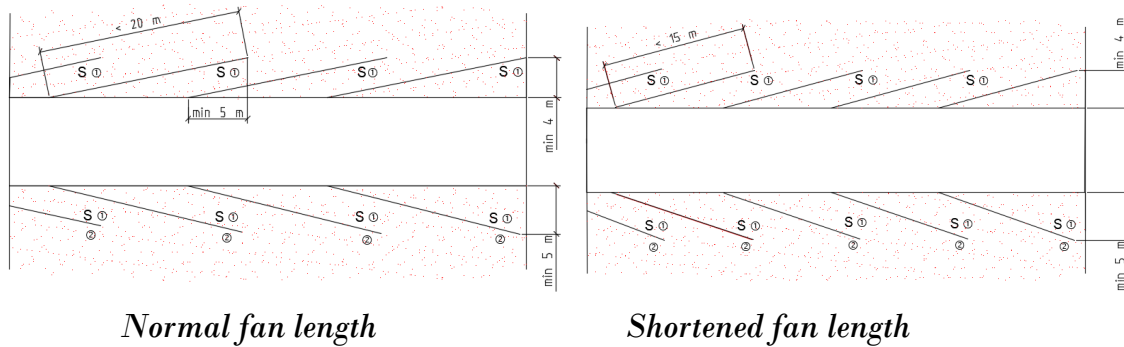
The profile of the grouting design for grouting class 1,2 and 3 for the Chalmers tunnel (Technical drawing 620/98-9950).
